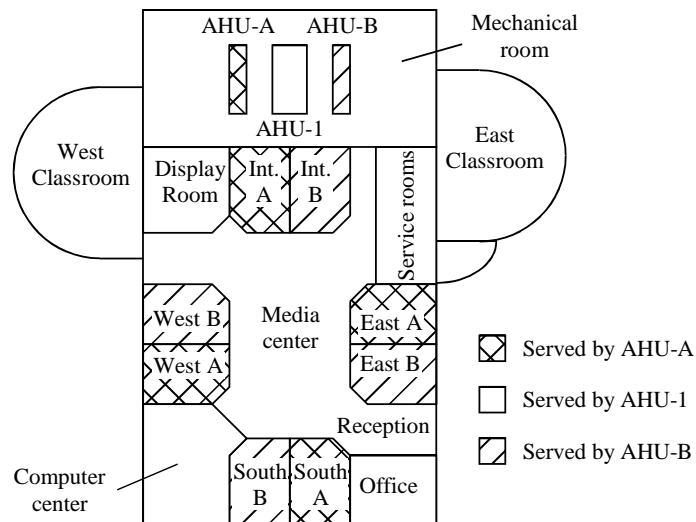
Floor plan of energy resource station at Iowa Energy Center
